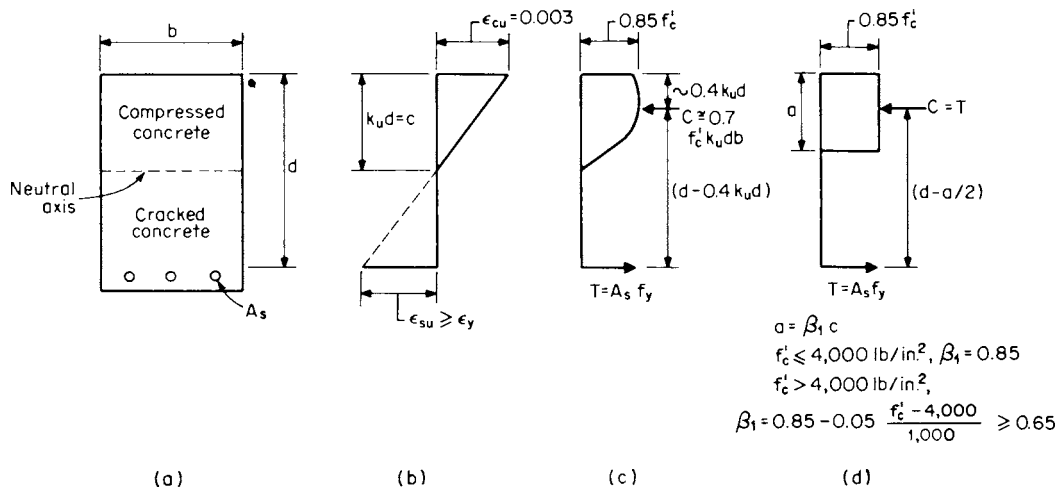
Stress and strain distribution in reinforced concrete beam at failure. (a) Section; (b) strains; (c) stresses; (d) approximate stresses.
